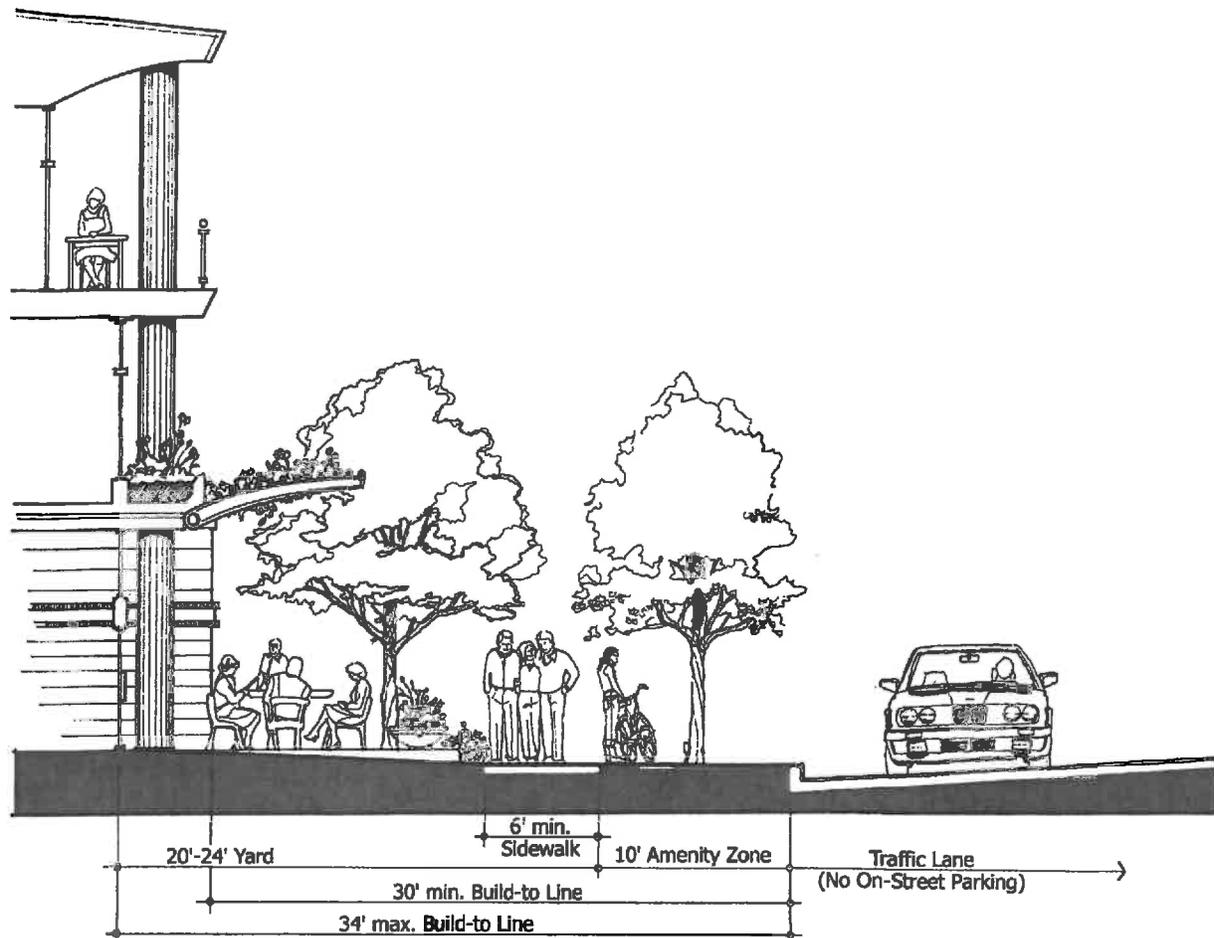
Street section, arterial streets and Greenville Avenue
